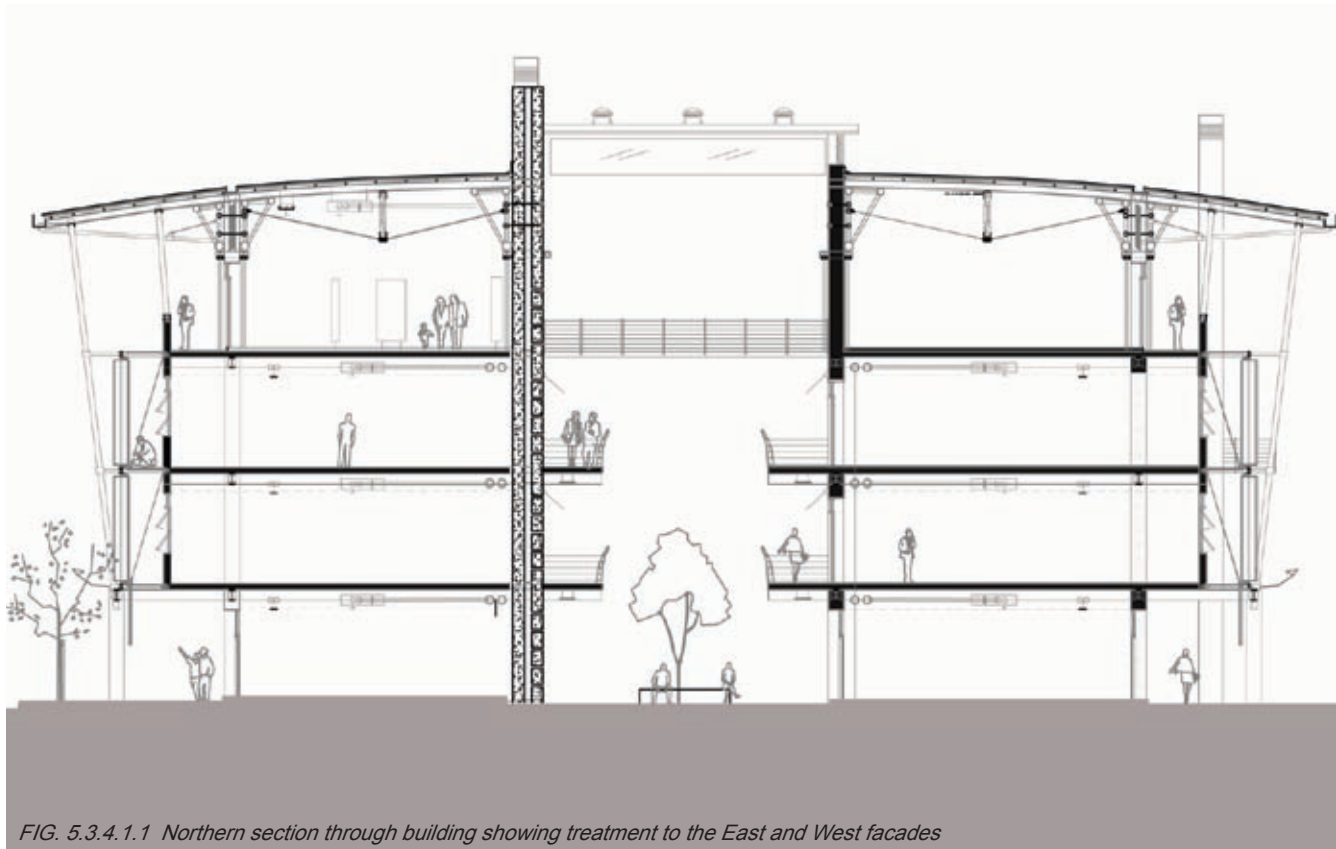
Northern section through building showing treatment to the East and West facades
